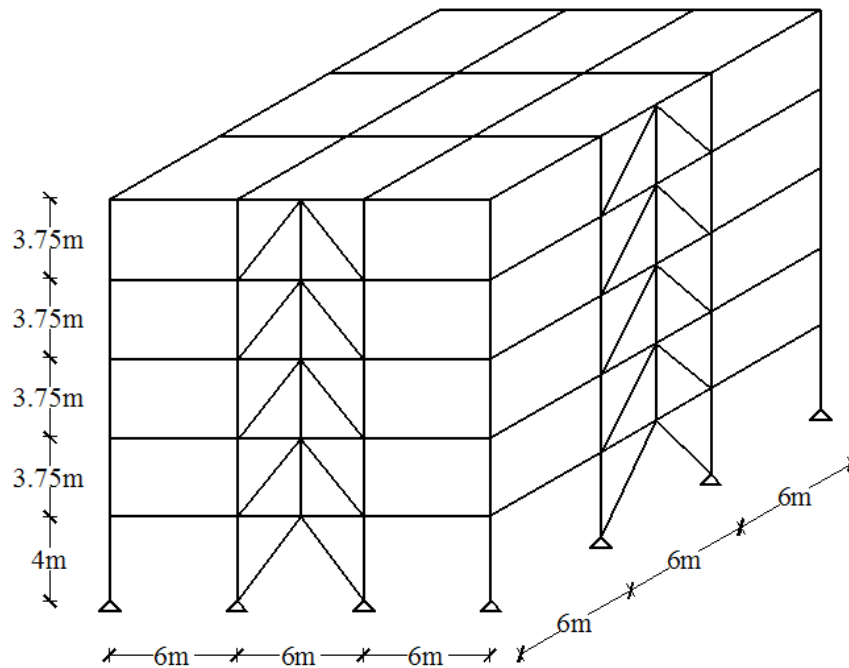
Symmetrical Plan and Section in central bay zipper brace.
